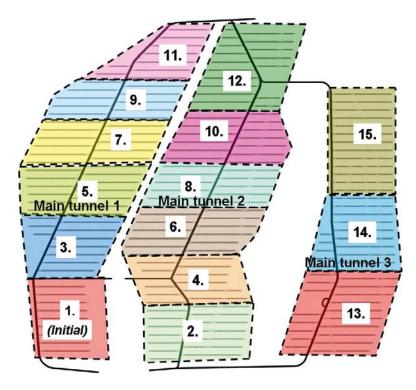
Example of how construction steps could be planned for D1 Layout. This could for instance be three-year steps. The numbers indicate in which order the steps are constructed.
